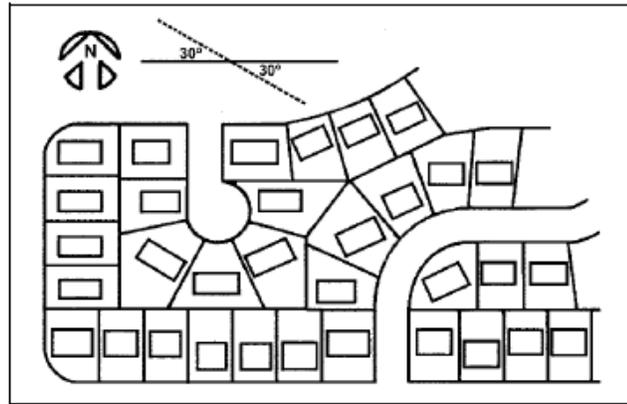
Solar siting in a proposed subdivision (City of Boulder Building Services Center, 2006).
